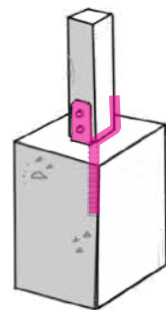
Pad footing with timber post, sitting on a galvanized steel shoe to elevate timber post to avoid timber decay.
